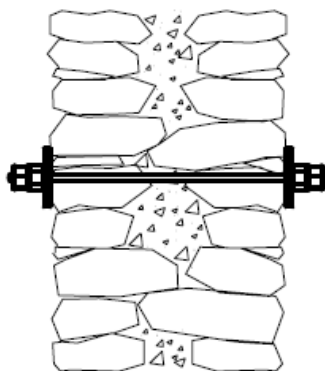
Transversal ties in masonry walls (Lamego 2014).
